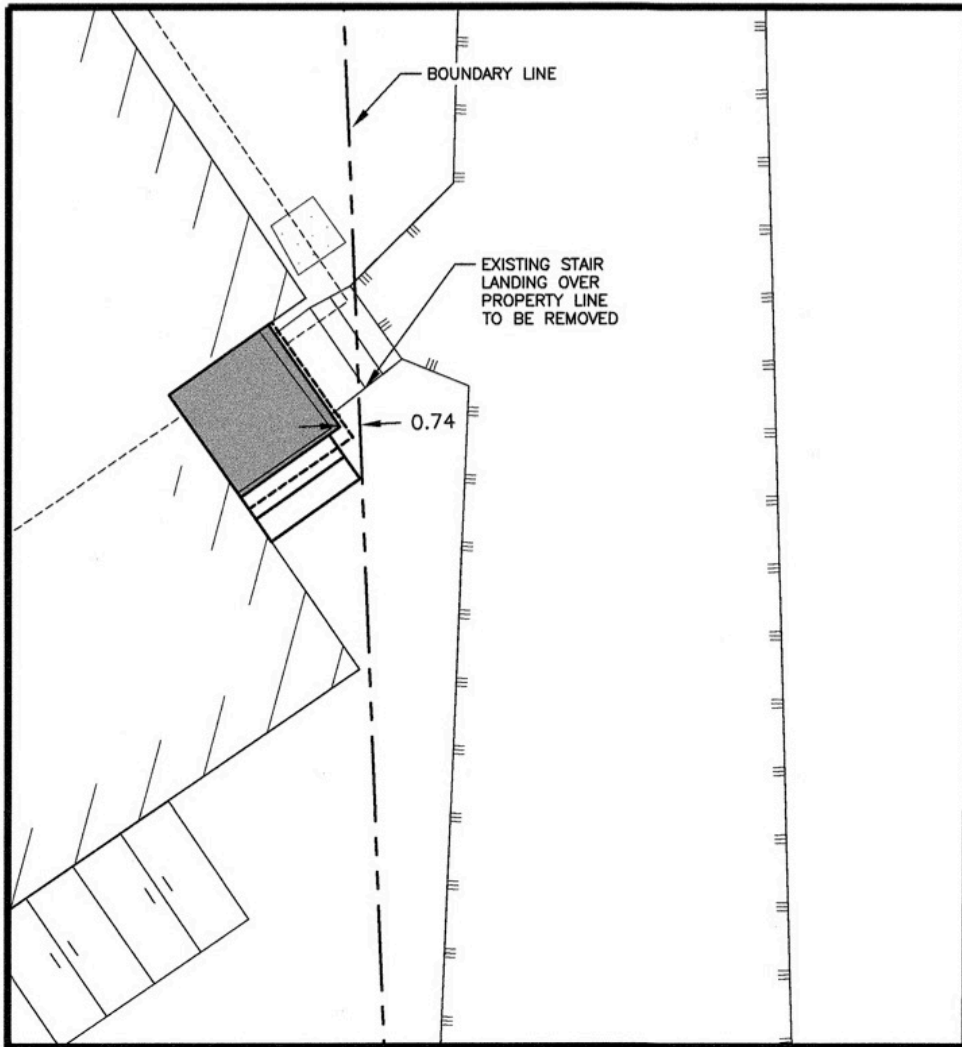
Detail from plan showing existing and proposed entry with stairs to be removed. (Extract from survey plan, Appendix 4).
